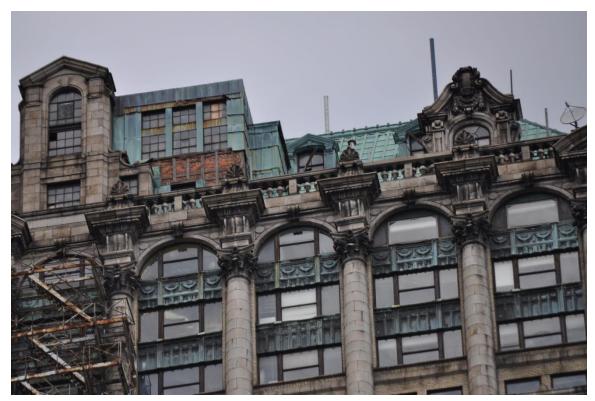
Exterior, Book Tower, South Elevation, Looking Up. 6/22/12
